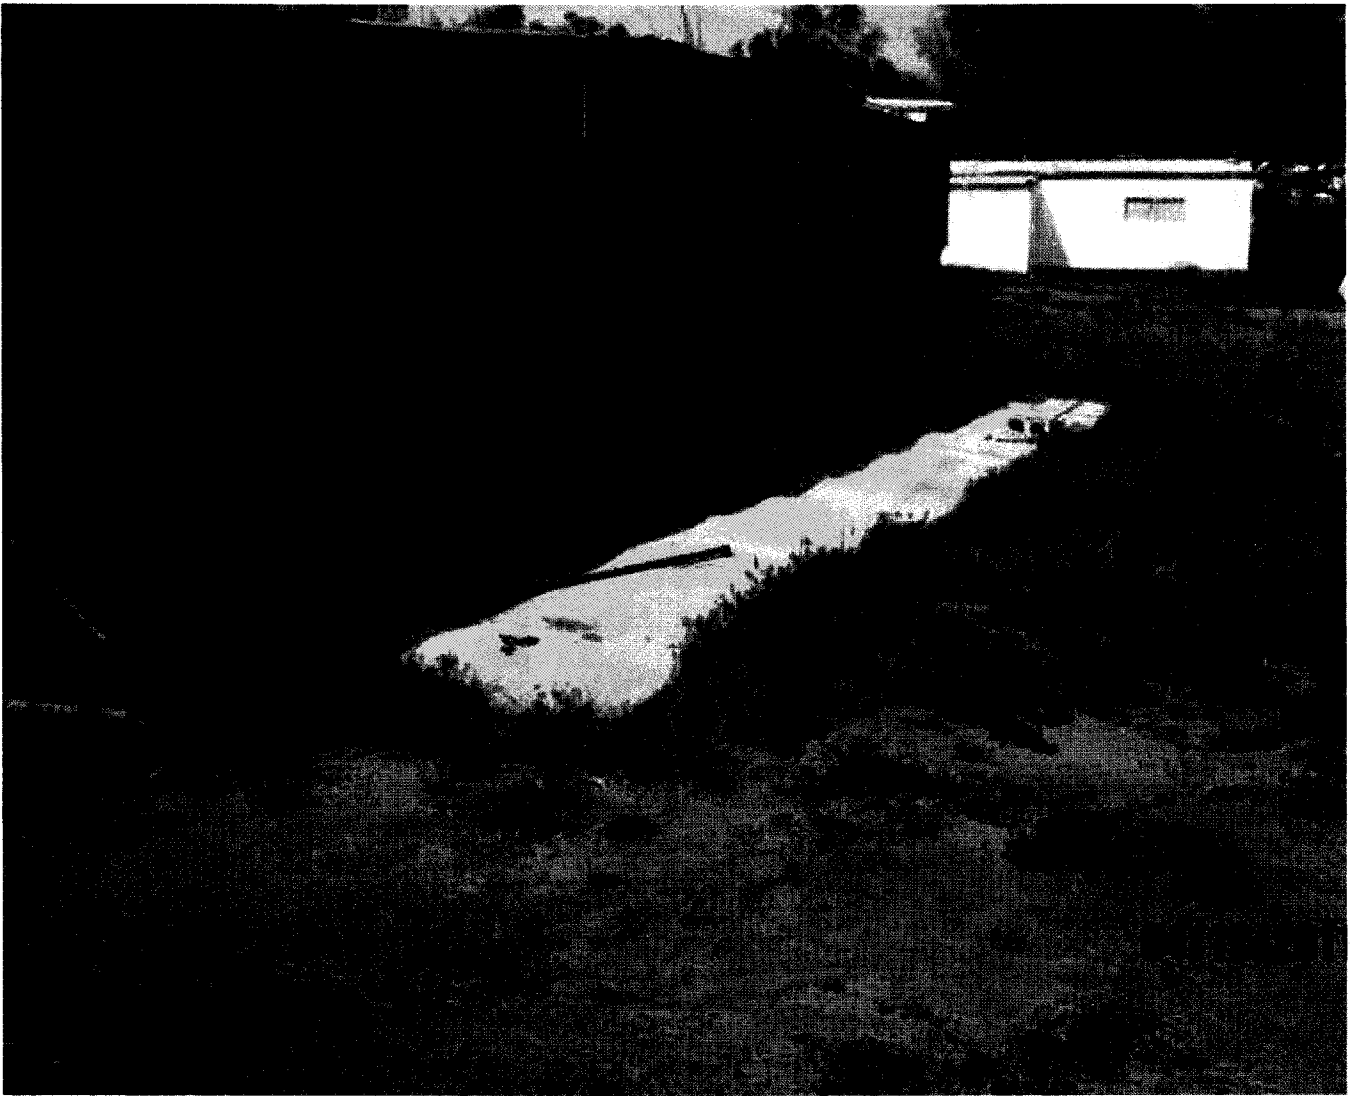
accumulated rubbish - vinyl pool wall - 04/19/2011
